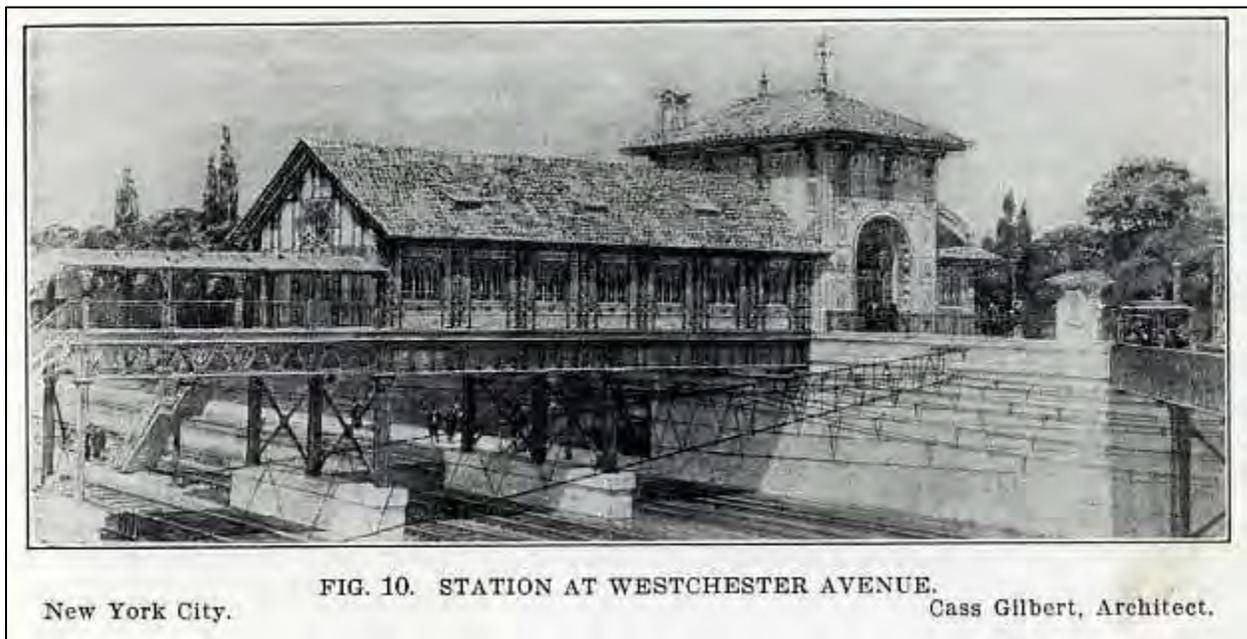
Looking at the south elevation of Westchester Avenue Station from the track level.
